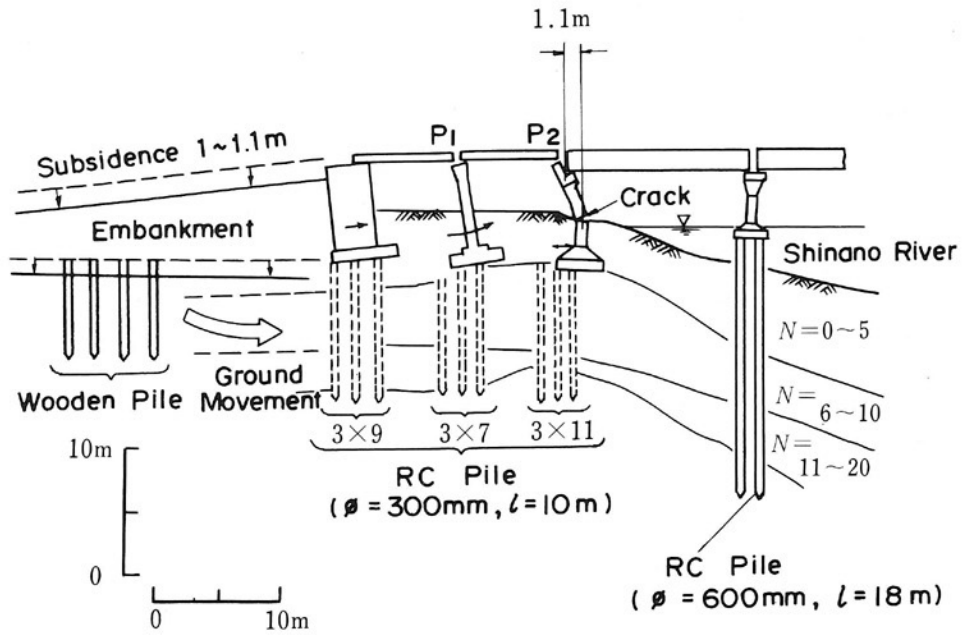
Damage to the abutment and the piers of Yachiyo Bridge on the left bank<sup>(11)</sup>
